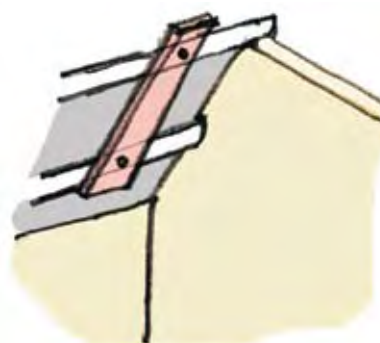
A typical sketch depicting installed header in masonry wall so as to stitch the wall and keep two layers together
